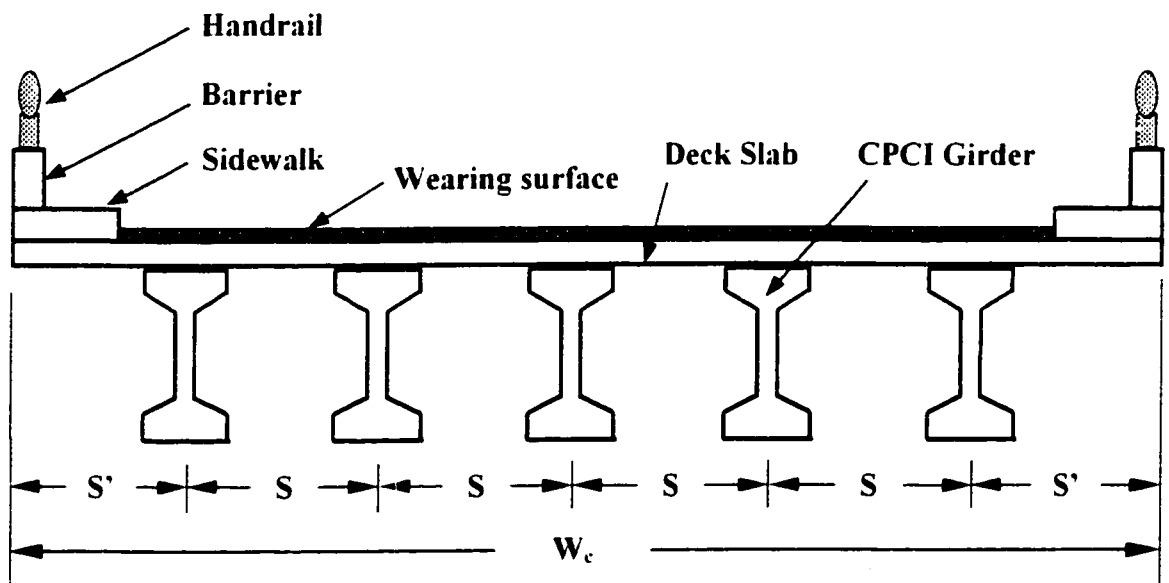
Section in Transverse Direction of a Slab-on-Girder Bridge
